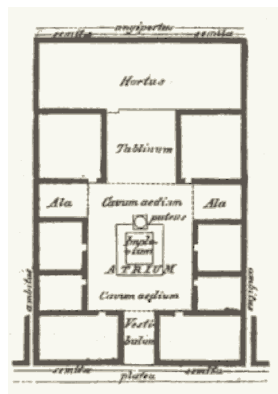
Original plan of the atrium house (Overbeck and Mau 1884, 248)
